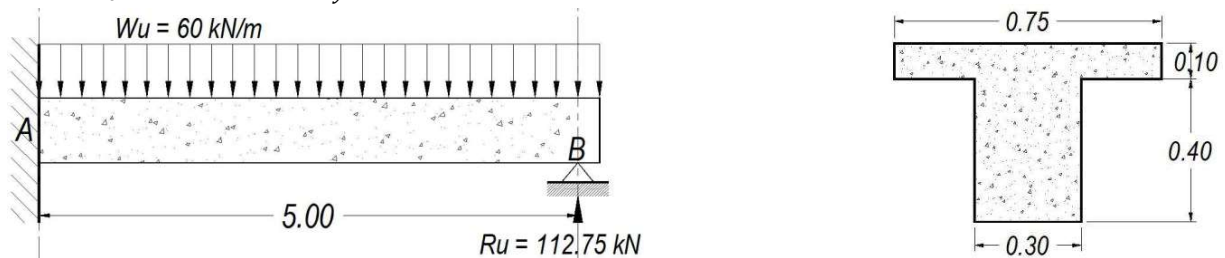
Propped cantilever beam Example 4.9-4.
